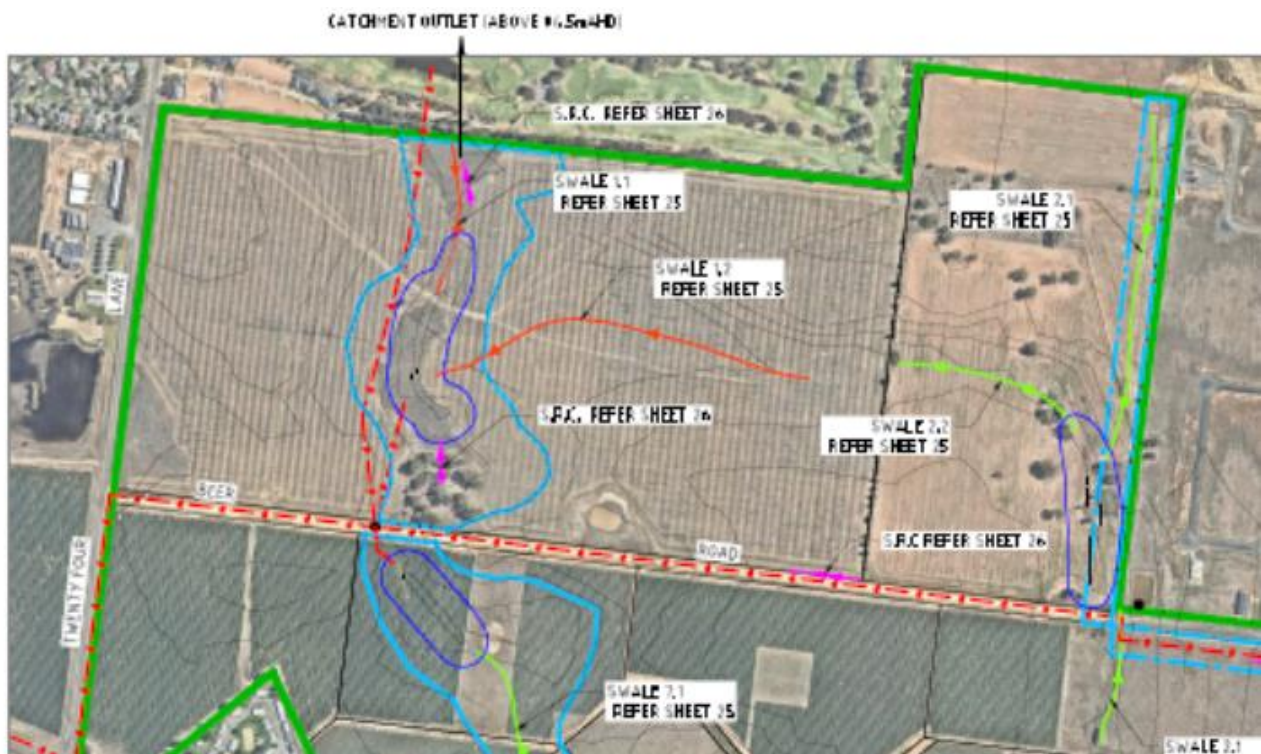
CATCHMENT 1 (SUBJECT SITE) – STORMWATER CONCEPT DESIGN
